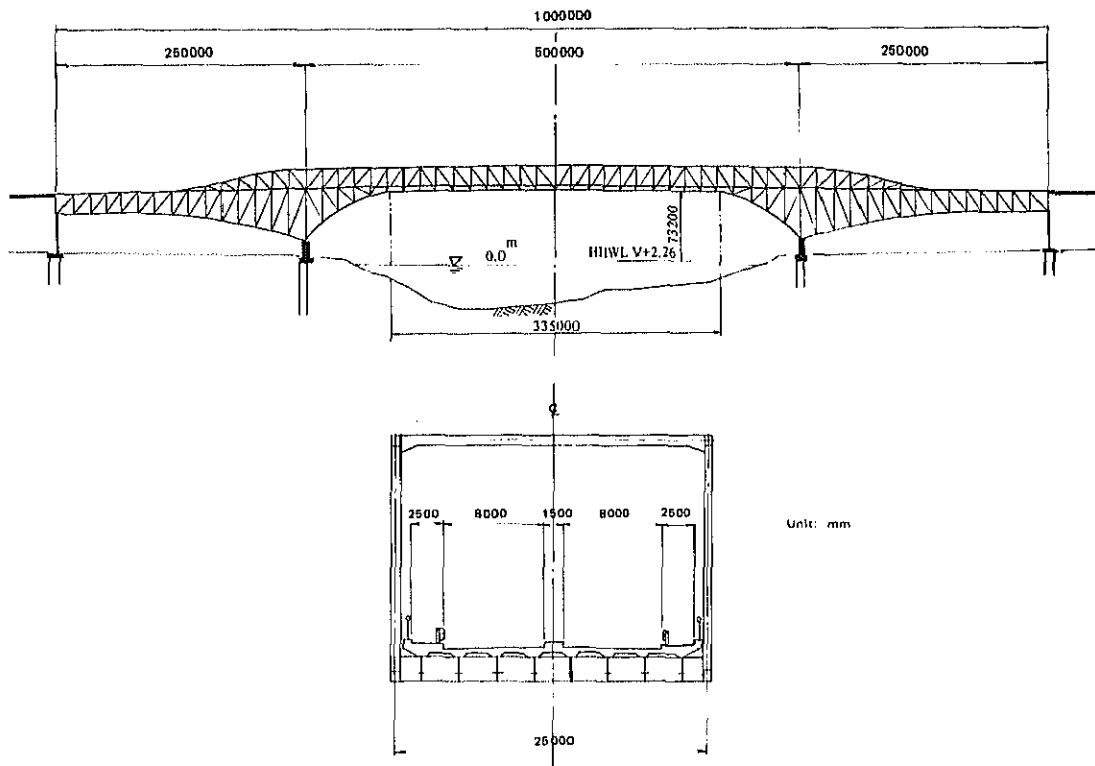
CANTILEVER TRUSS BRIDGE
